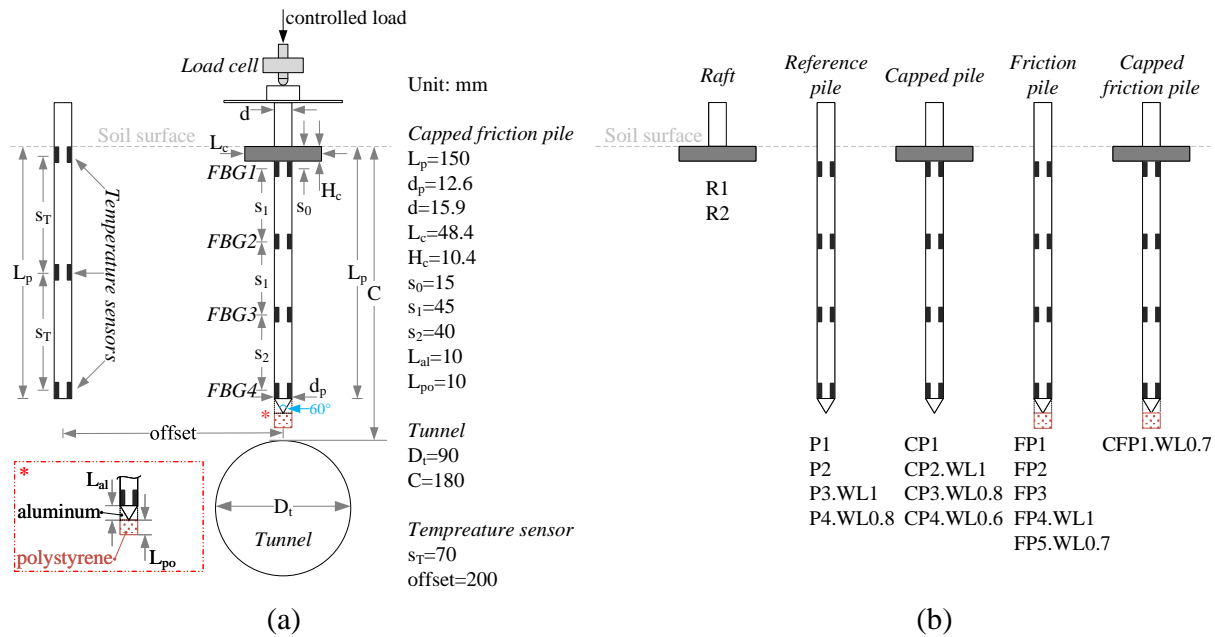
Illustration of (a) layout of capped friction pile in tunnelling test and (b) foundation types
